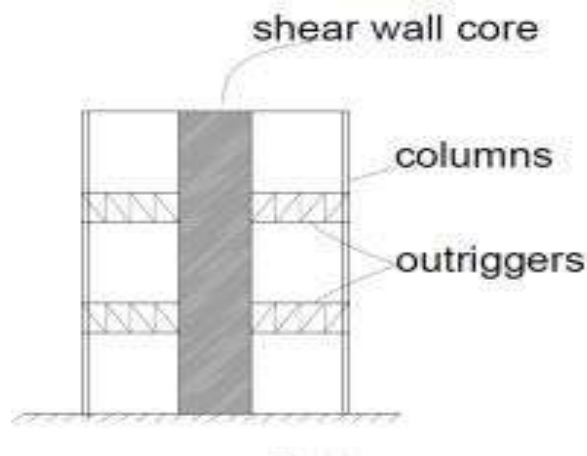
4 Building Model with Shear Core and Outrigger Bracing
